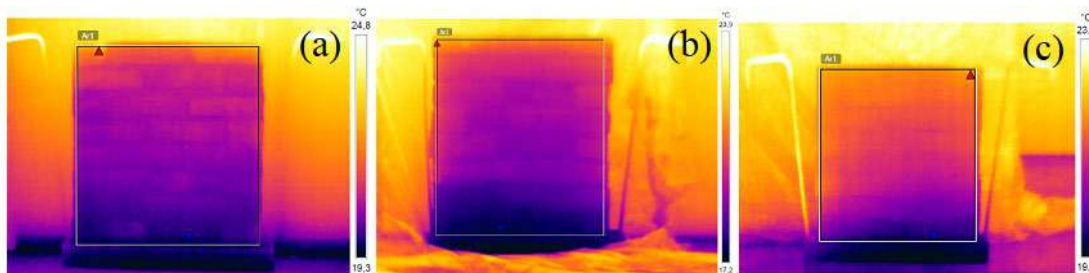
Sample PA2: a) dry wall; b) humid wall; and c) wall at 28 days
